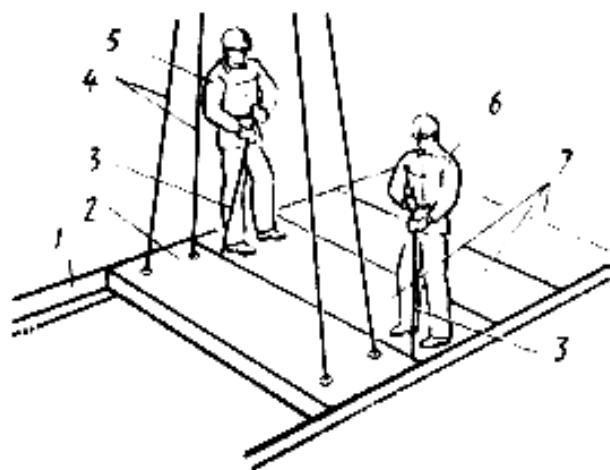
Panel alignment: 1 – crossbar; 2 - mounted panel;
